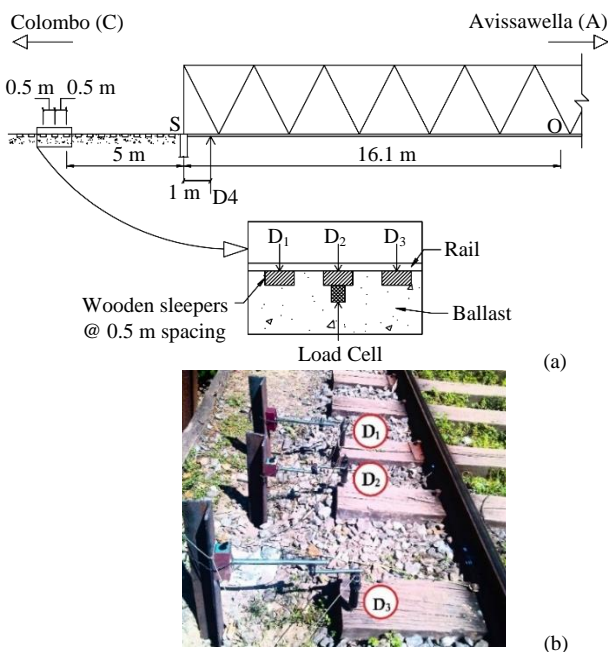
Arrangement of displacement transducers and load cell (a) schematic drawing; (b) assembly in the test location
